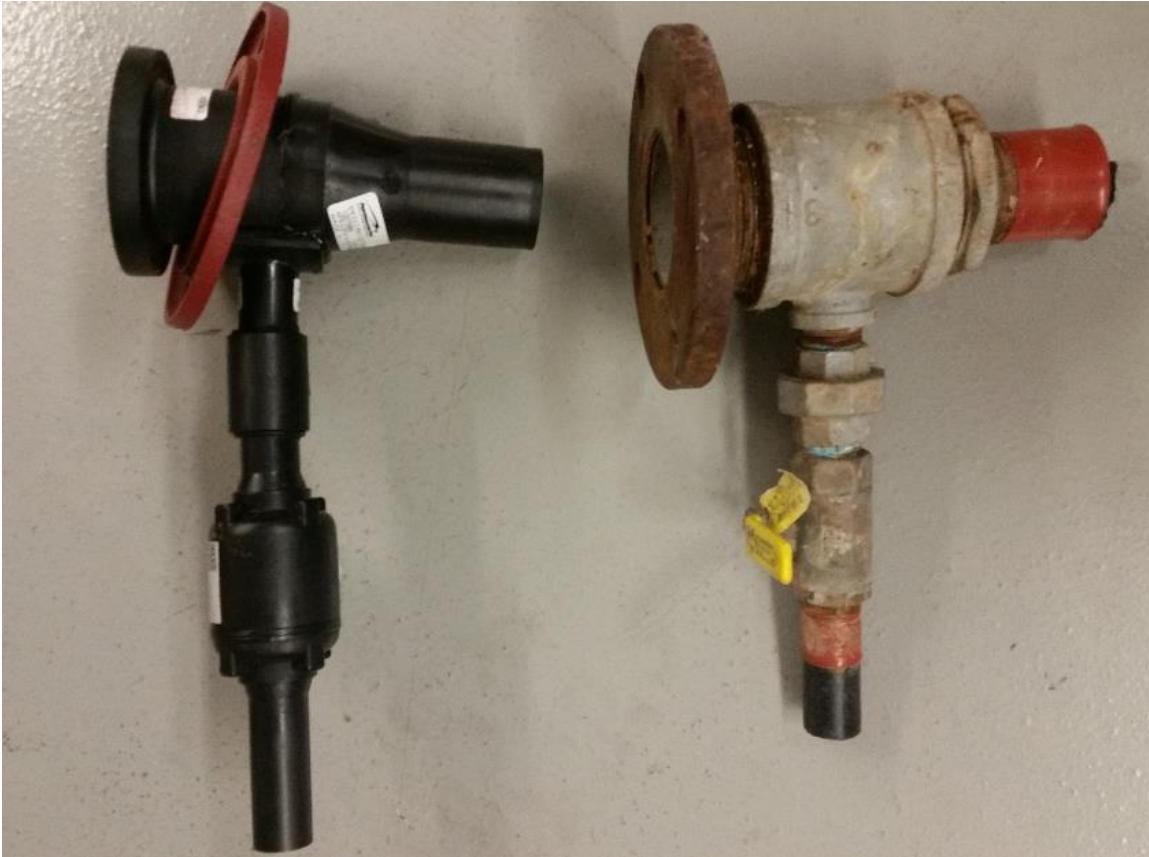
Thermosiphon heads. LEFT: HDPE thermosiphon head. RIGHT: Old thermosiphon head.
